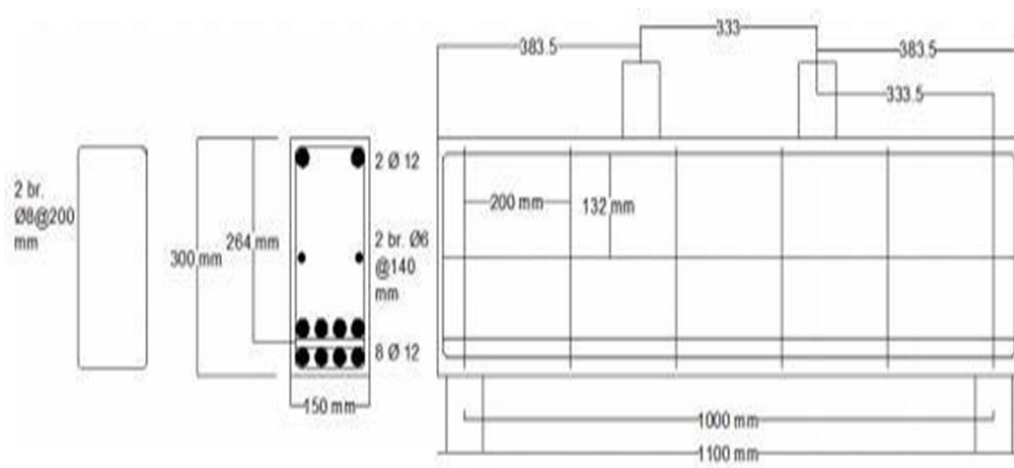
Reinforcement details of deep beam by Ahmed Ismail el-kasses et al., (2020)
